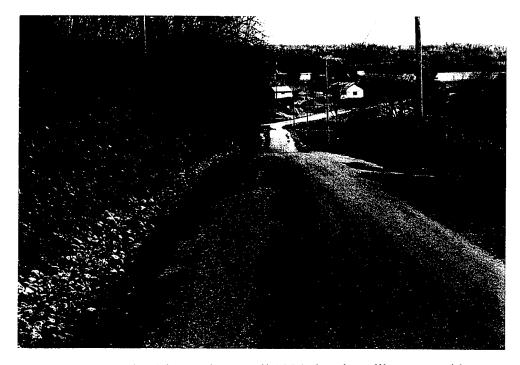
Inspection Photo taken April 1994 showing alligator cracking.
